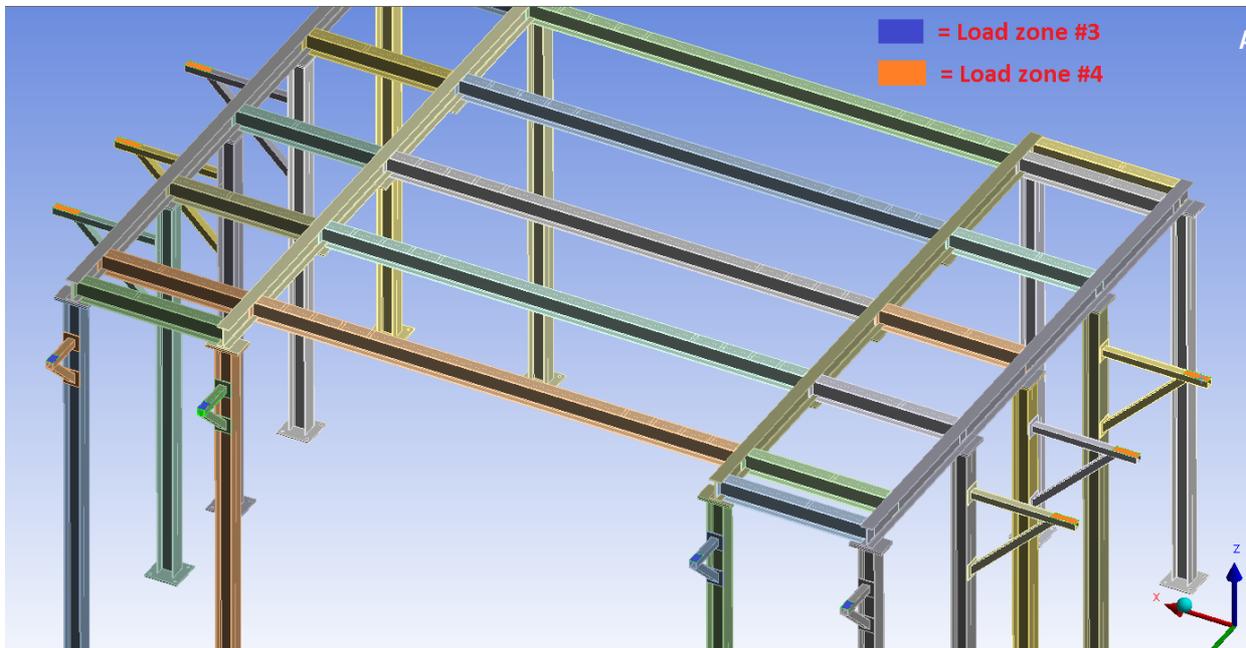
Load zones 3 and 4 on cantilever arms mounted 600mm down from the top of the structure for pipework C and D respectively
